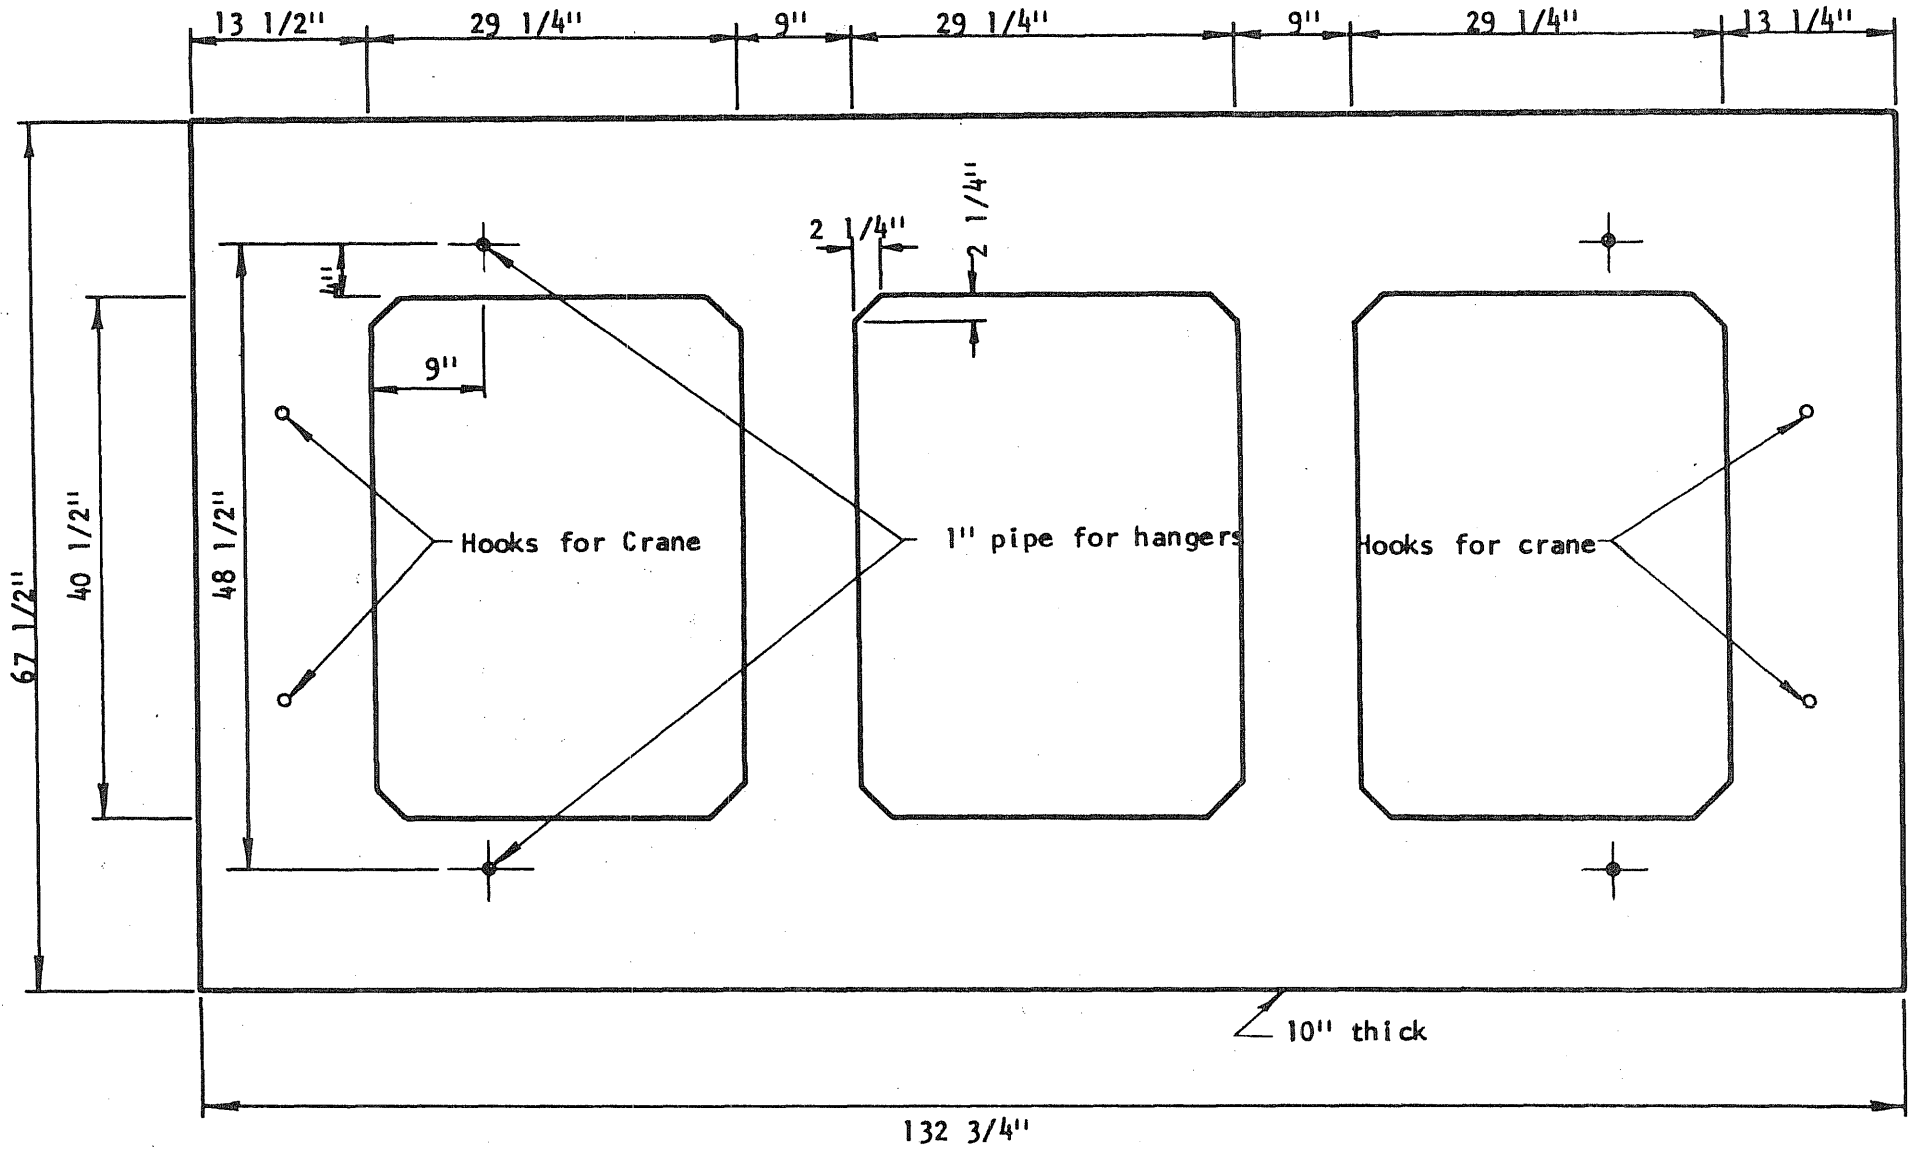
DIMENSIONS OF CONDUIT SPECIMEN R1
